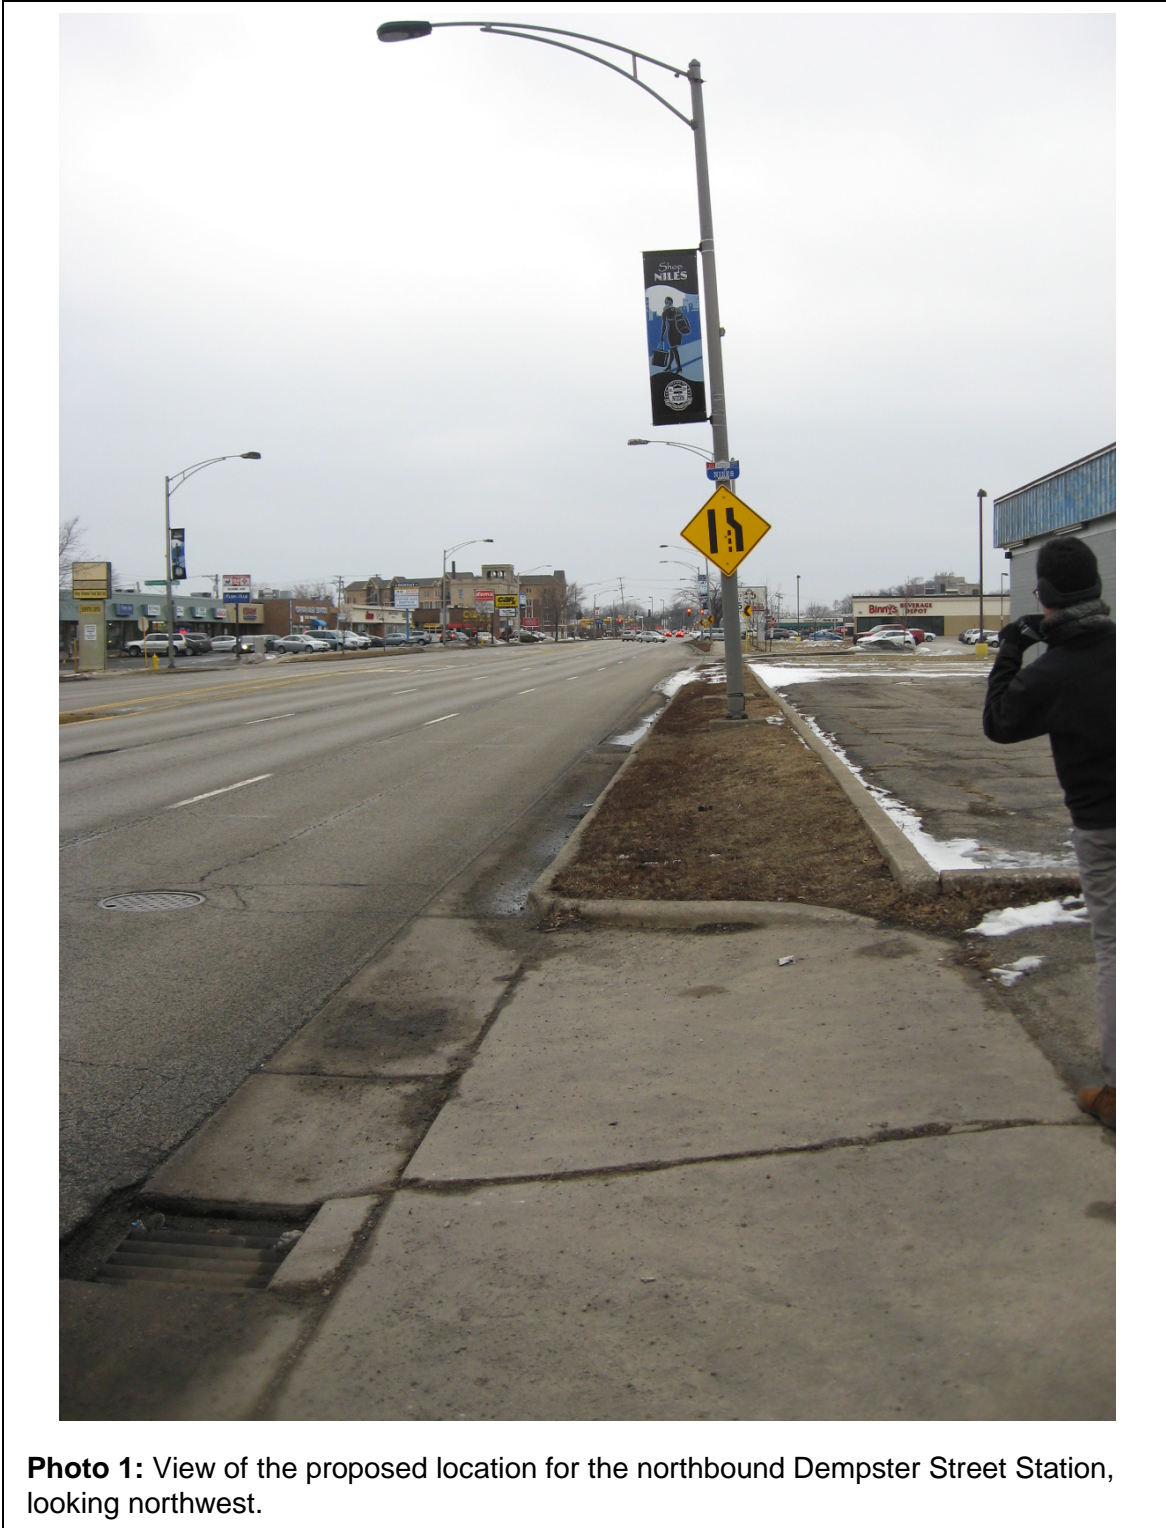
View of the proposed location for the northbound Dempster Street Station, looking northwest.
